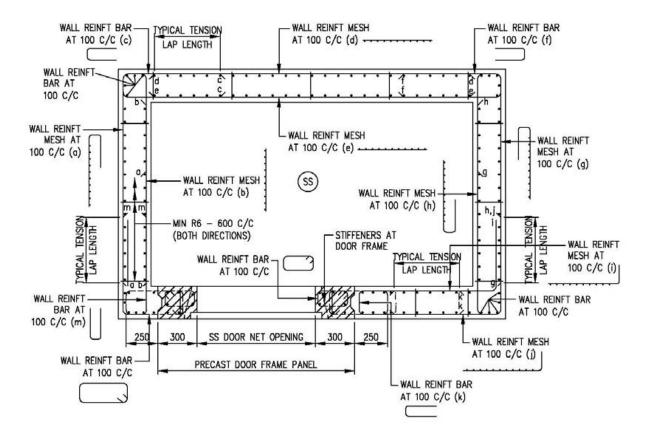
(I) SECTIONAL DETAILS OF SS SLABS/ WALLS FOR S/C SS
